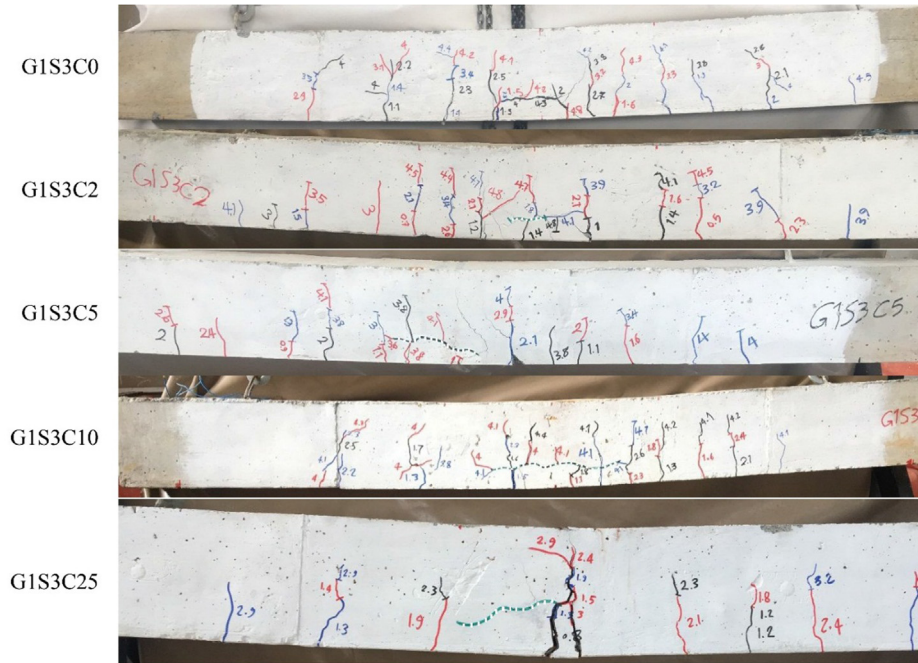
The cracking pattern of specimens 3 stirrups.
